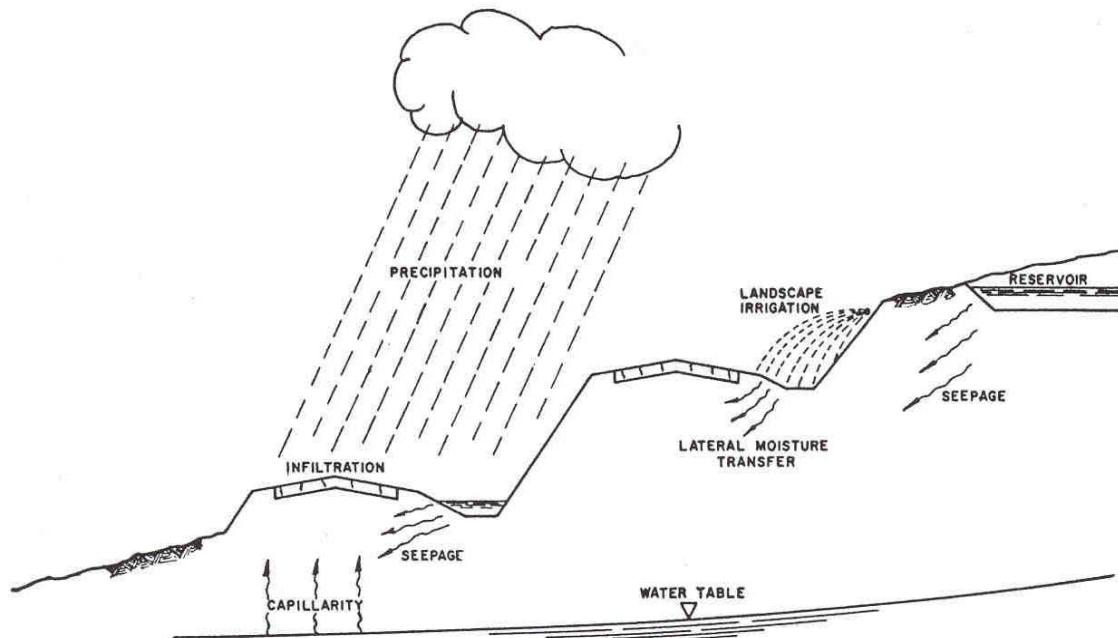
Potential Sources of Water in Pavement Structure. (Cedergren et al. 1973)
